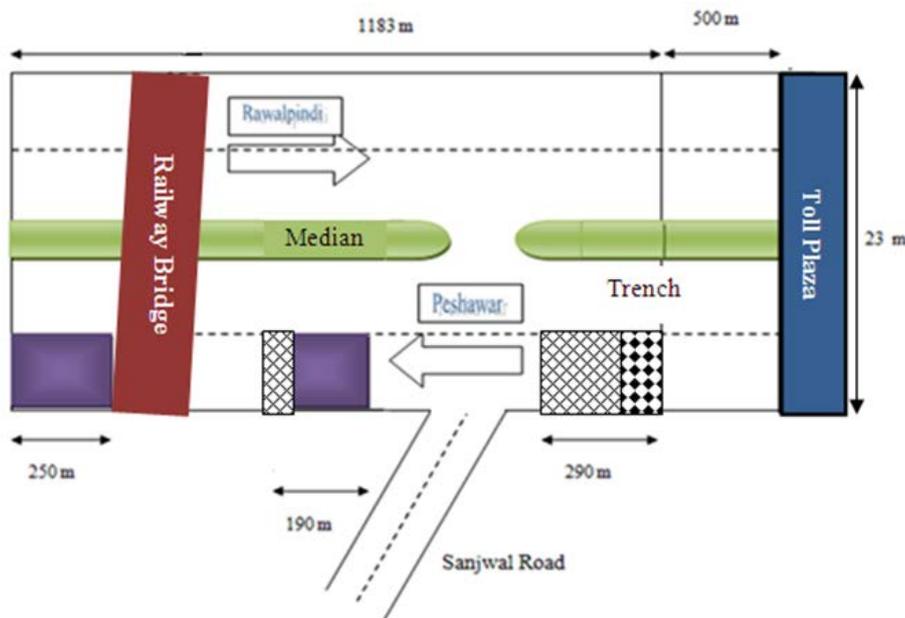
Site layout and testing plan of selected National Highway (N-5) portion
